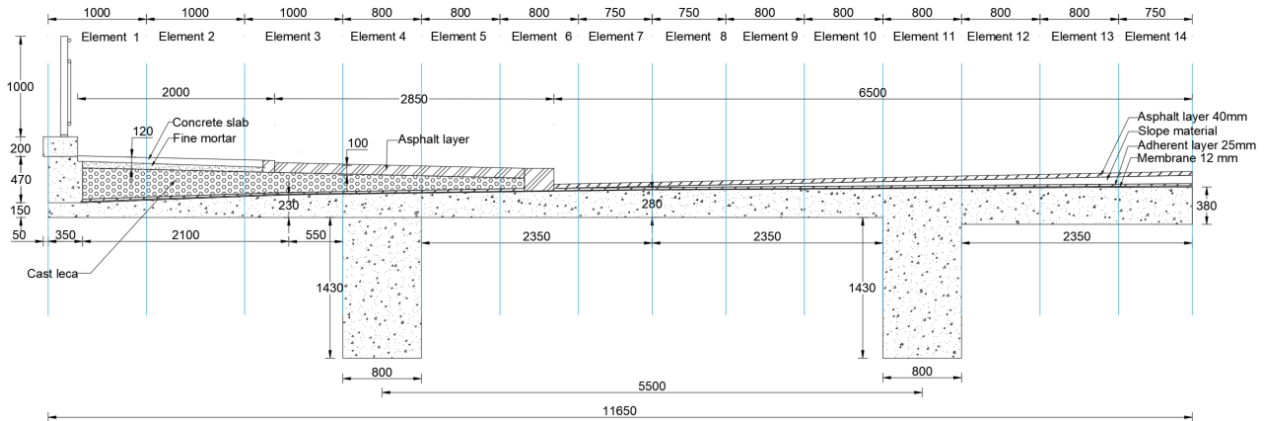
Cross-section of Elgeseter Bridge [mm]
